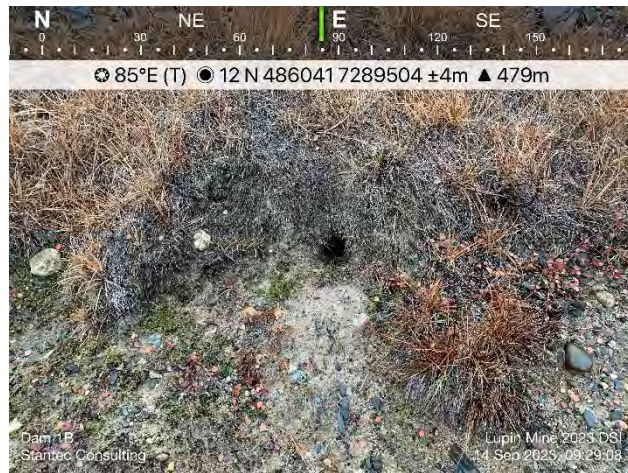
A small animal burrow situated near the crest of Dam 1B.
